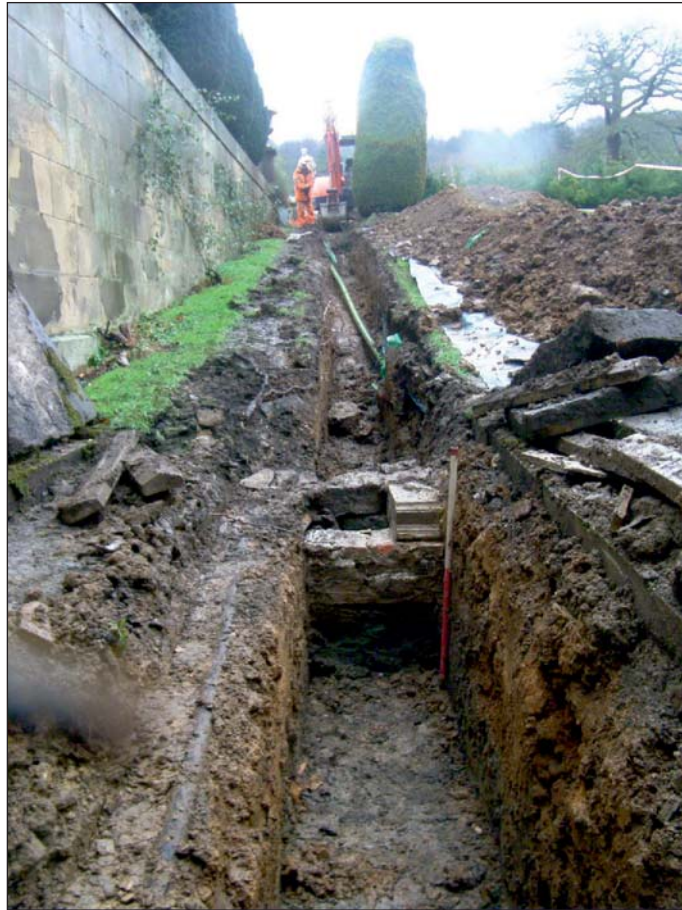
View of southern end of Trench, looking east from the North Range, noting culvert 1009 with reused stone
